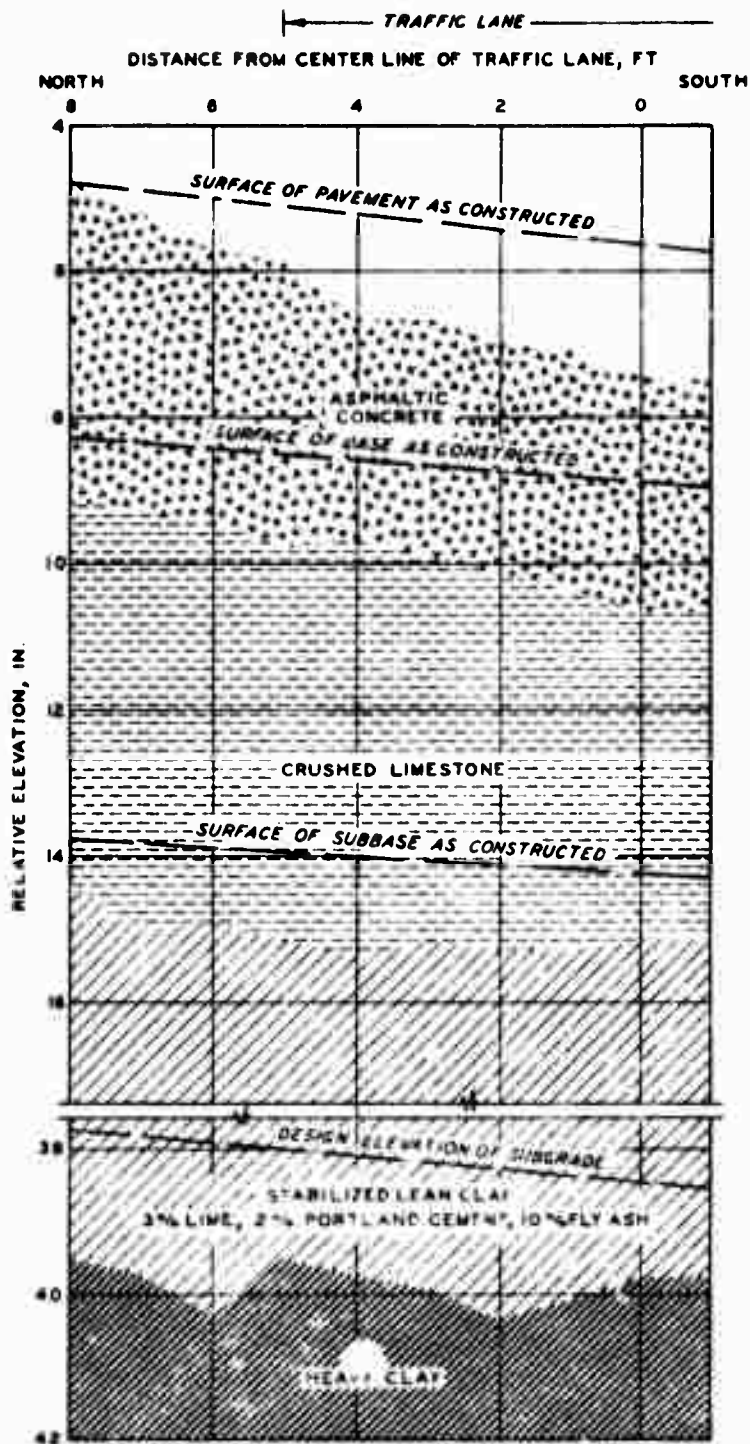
Test pit profile of item 1, Lane 2, flexible pavement test section. Station 0+28 after 600 coverages of 240-kip twin-tandem assembly
